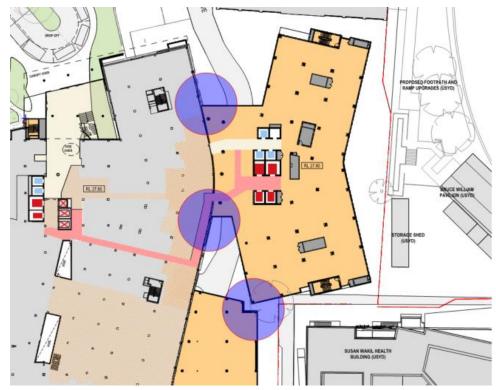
Plan detailing exposure on Level 3 of external walls of the new East Tower from the existing Main Hospital Building including the Eastern Extension
